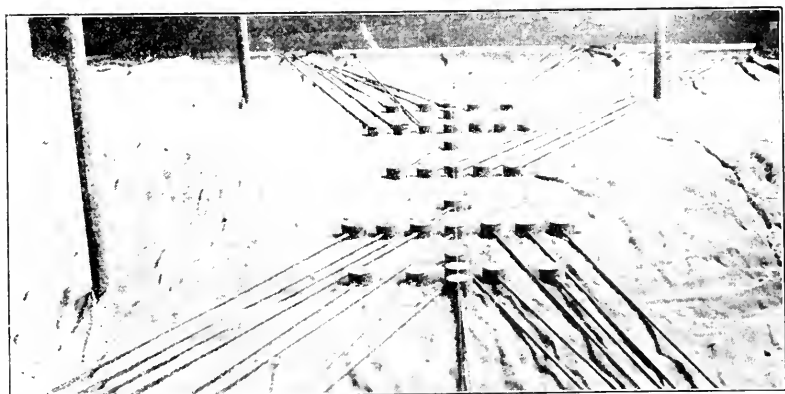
ARRANGEMENT OF CAPSULES FOR TESTS WITH BROKEN STONE BALLAST.
